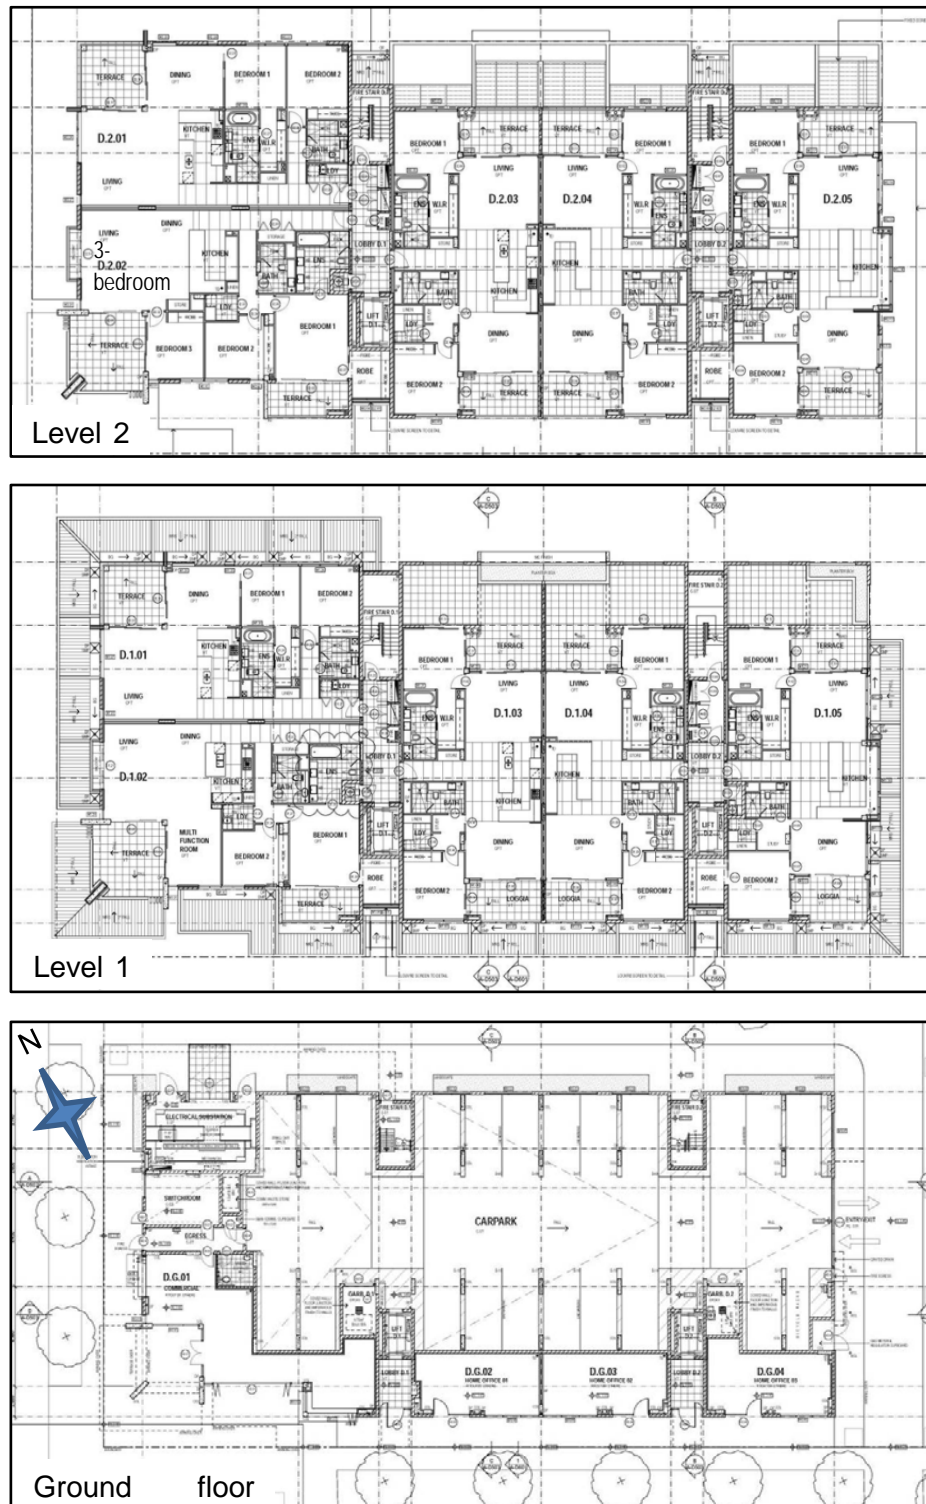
Ground, levels 1 and 2 of the low rise apartment building
